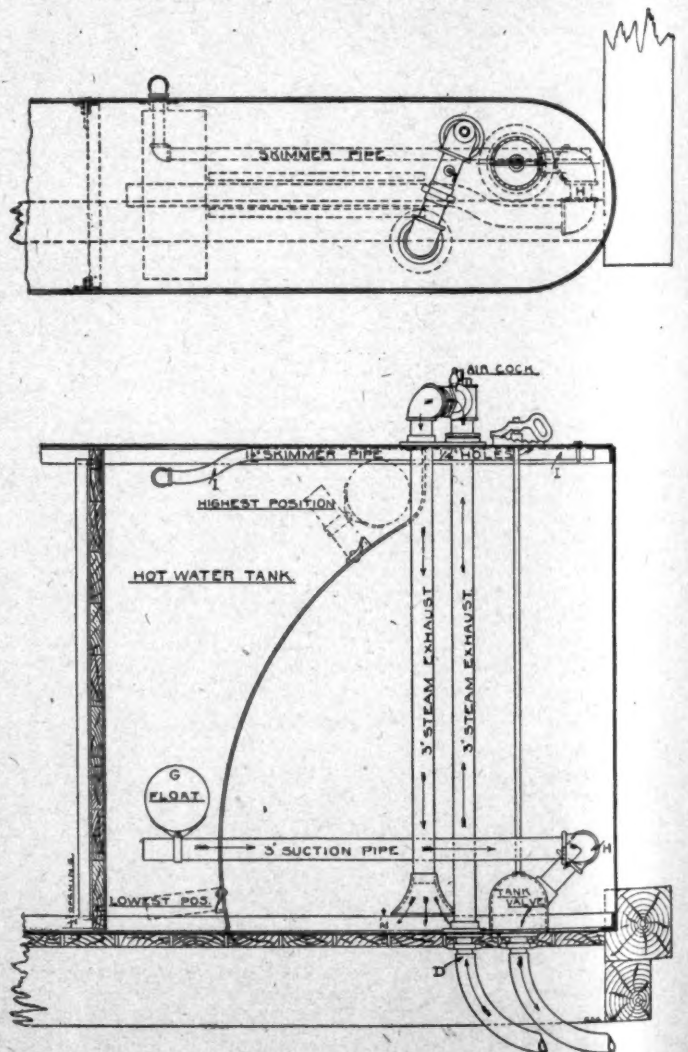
Arrangement for Exhaust Steam in Tank.
